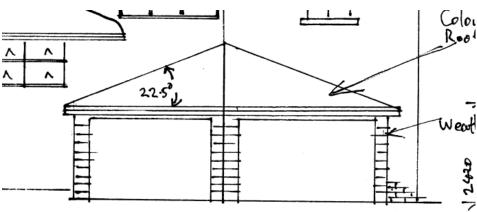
Proposed weatherboard garages with shared party wall, to be constructed at the new boundary line.
